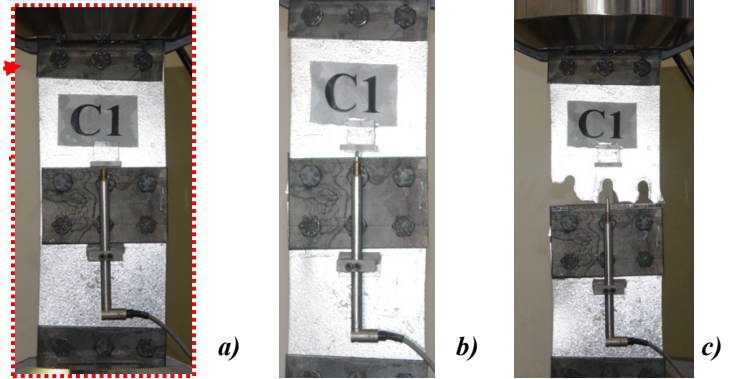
Connection Specimen Before (a), During (b) and After (b) the Test
